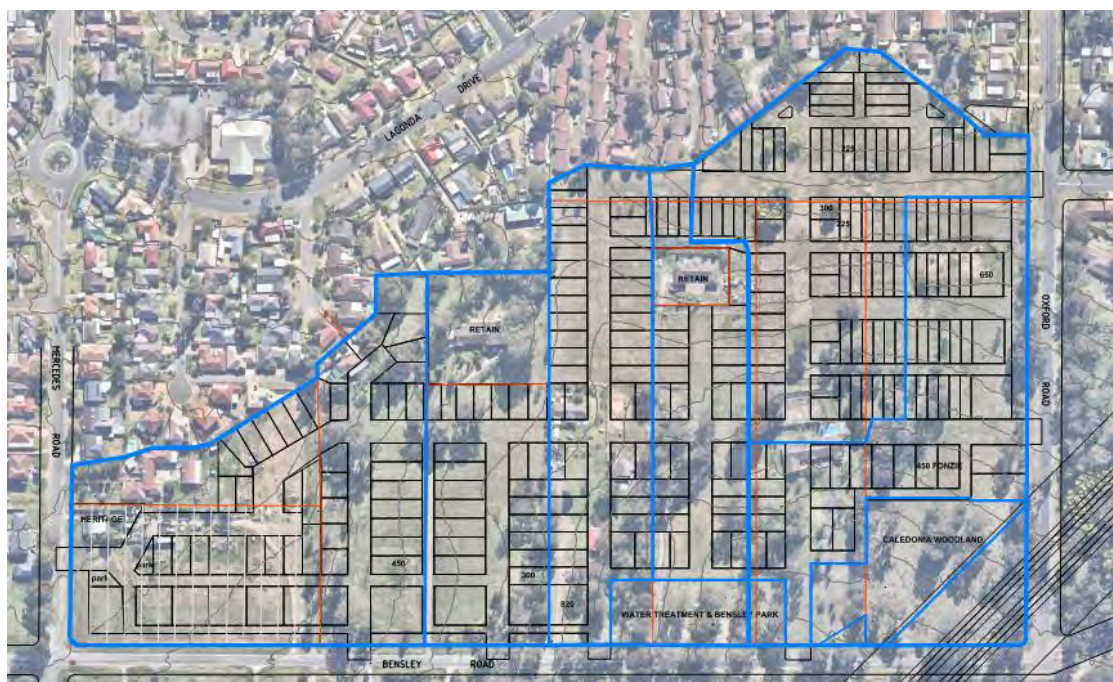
Sub-Catchment Plan of Subject Site Under Post-developed Conditions
